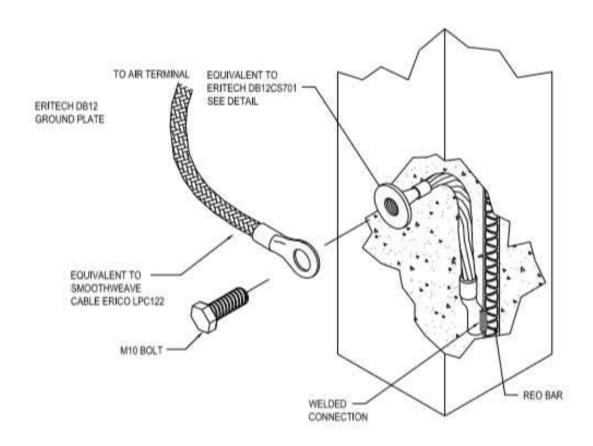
Typical Bonding Columns and Smoothweave Cable Lightning Protection Details
